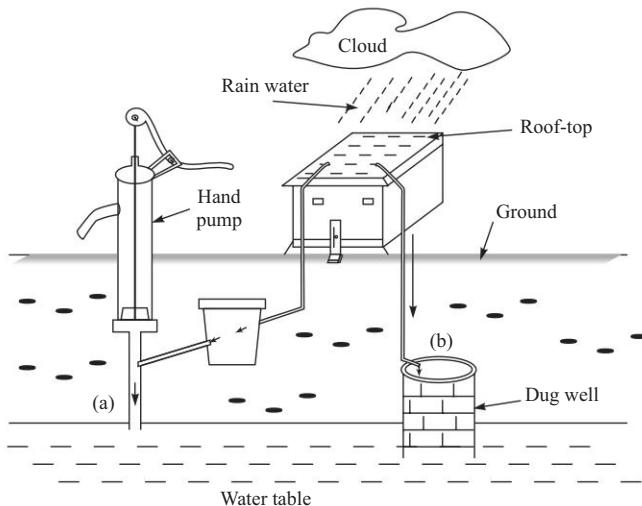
Roof-top rainwater harvesting by recharging (a) through hand pump, or (b) through an abandoned dug well
